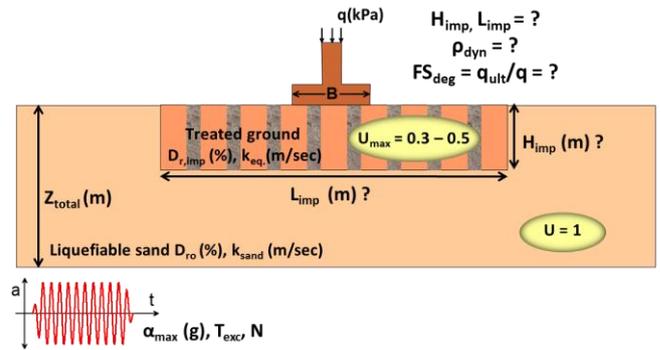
Typical configuration of the proposed foundation scheme of shallow foundations on top of liquefiable soils with prior ground improvement with the use of gravel drains.
